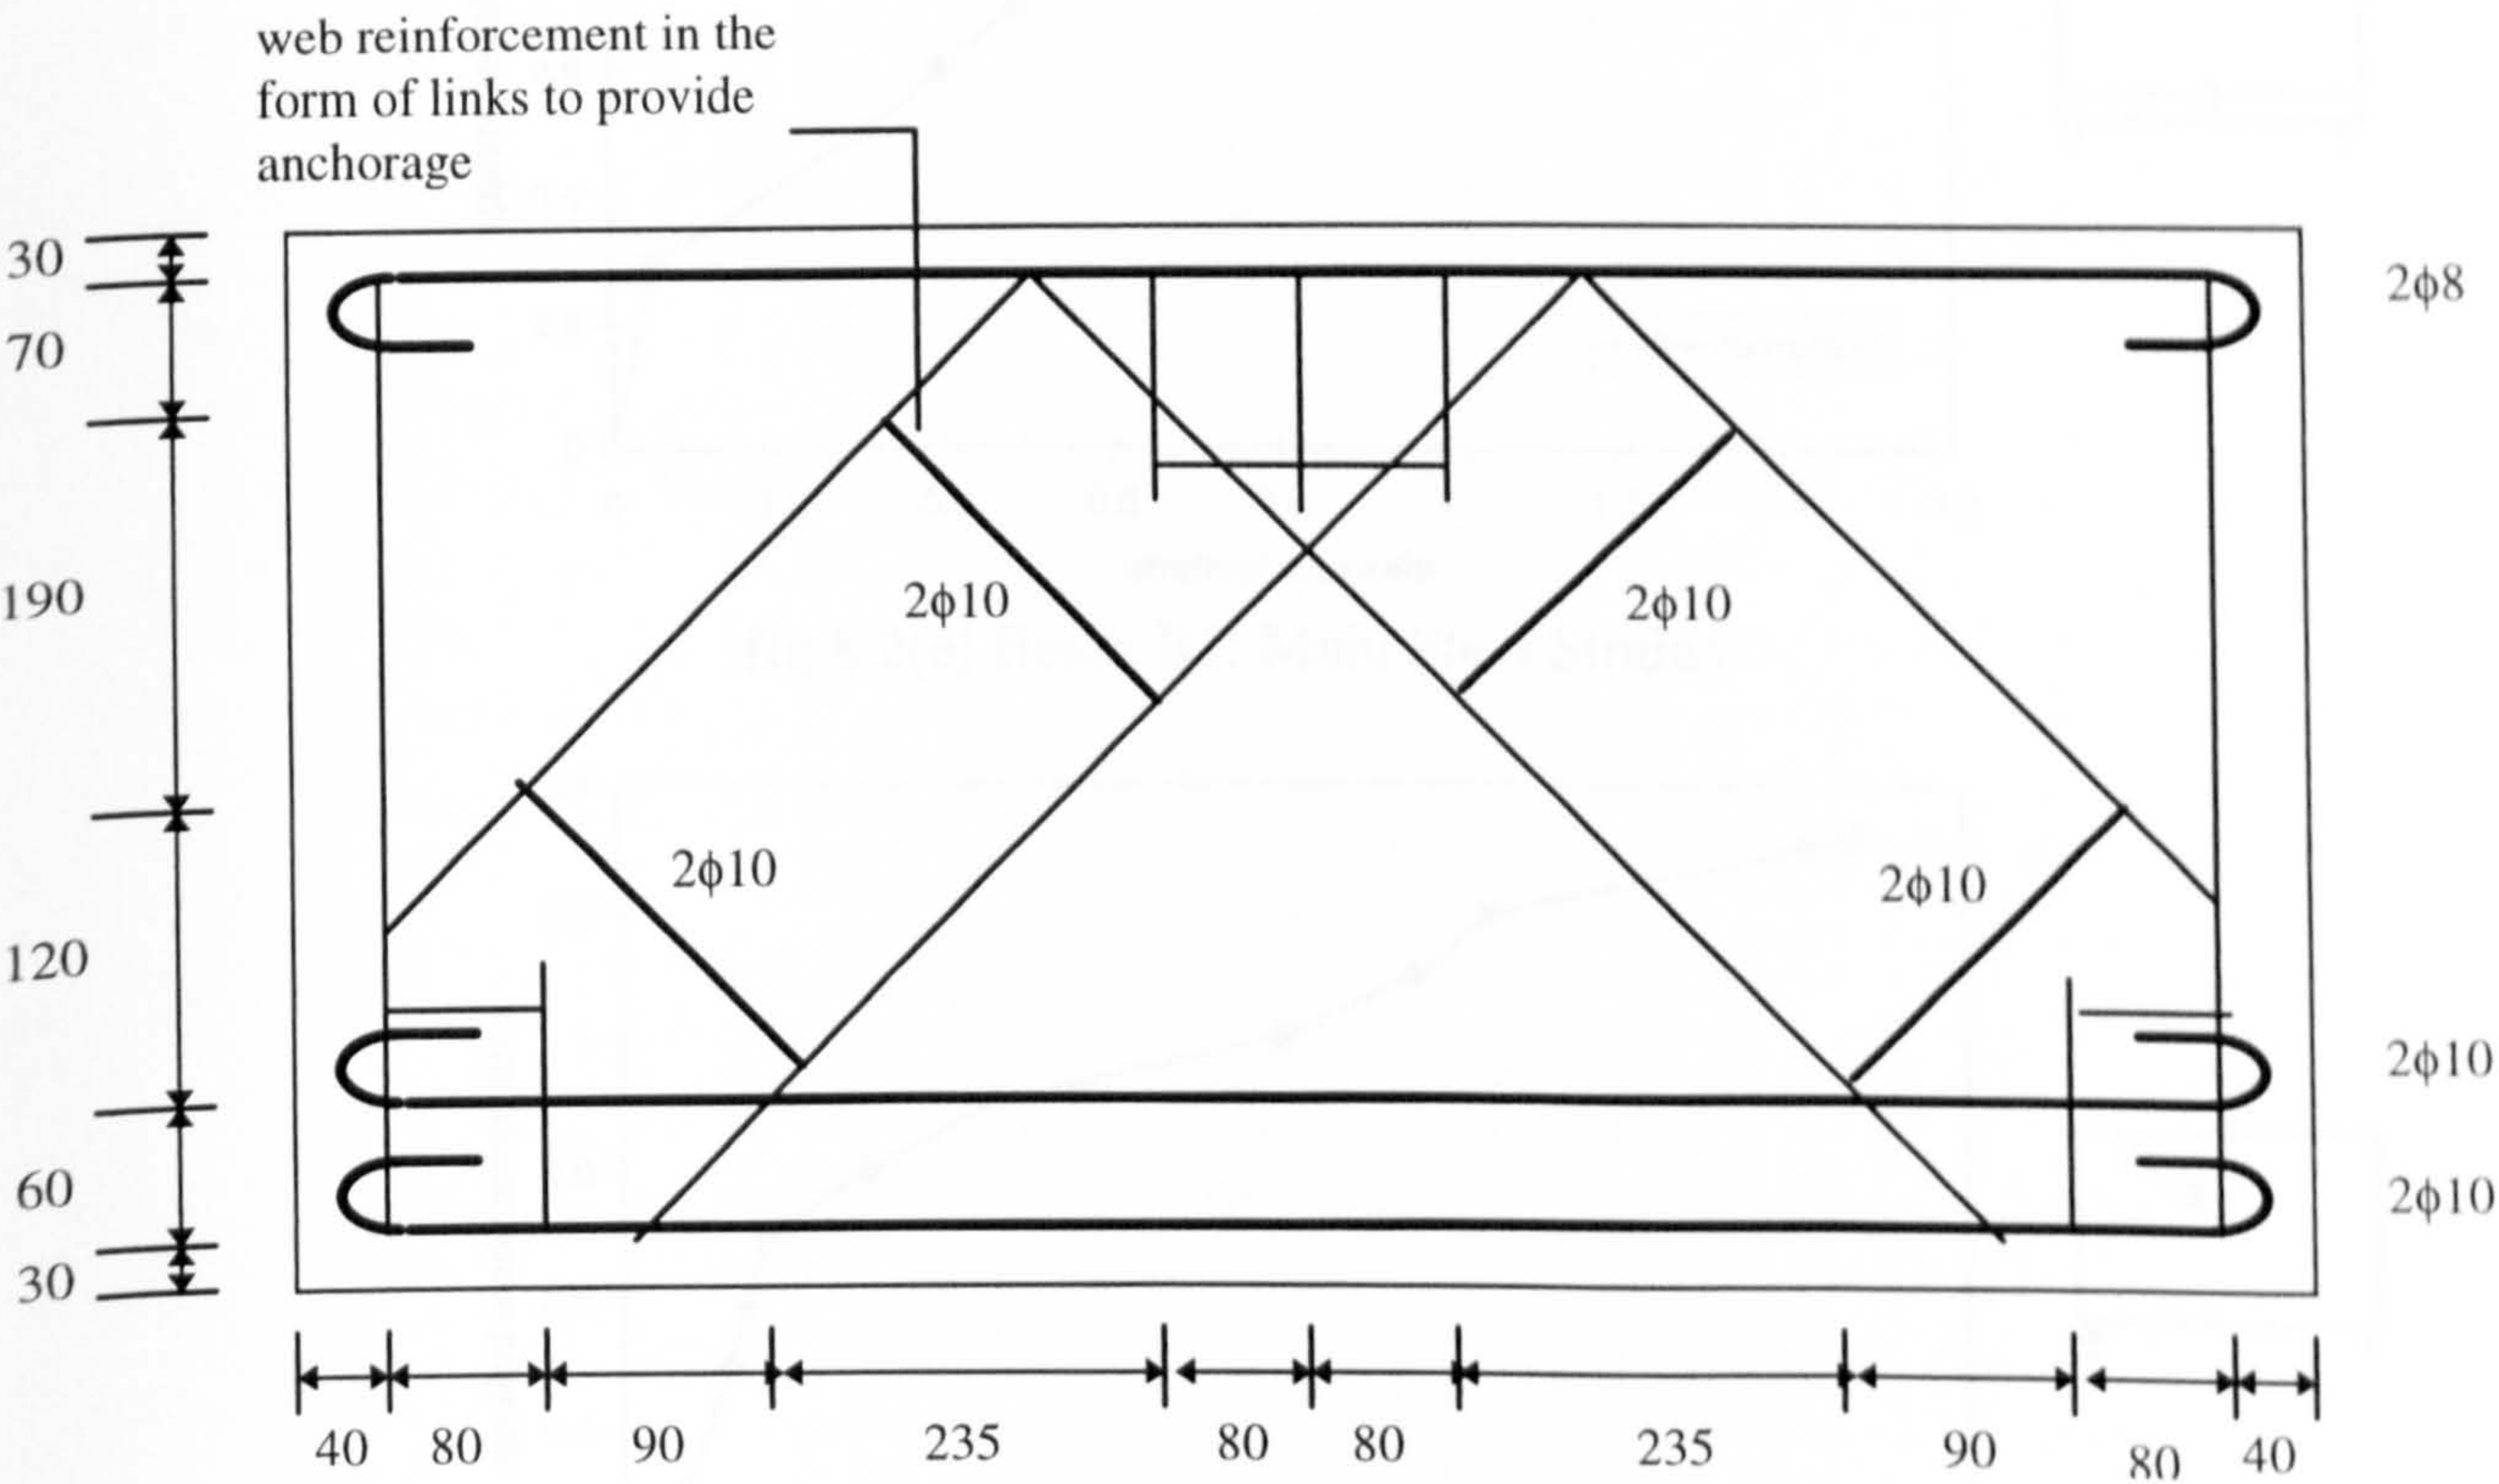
(c) Beam B1 Reinforcement Details, al sizes in mm, all stirrups $\phi 6$
